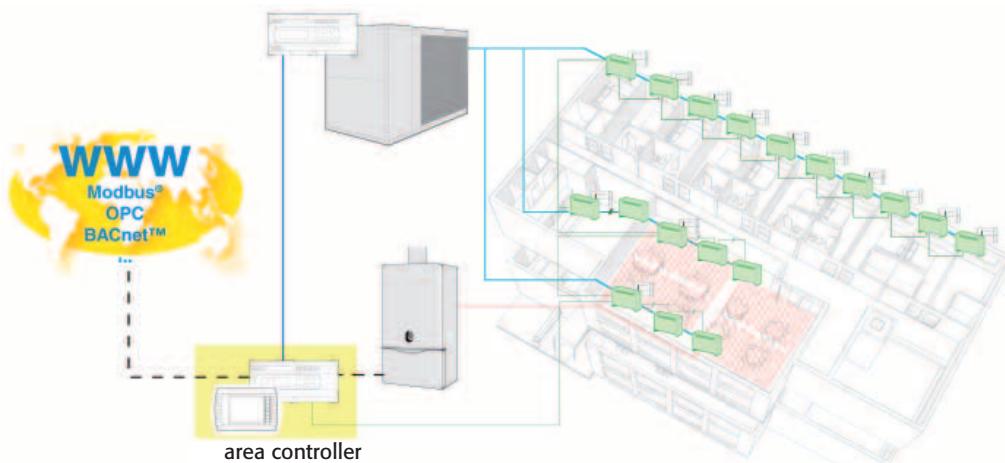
example of integrated control for chiller/HP and boiler for convection and/or radiant heating
